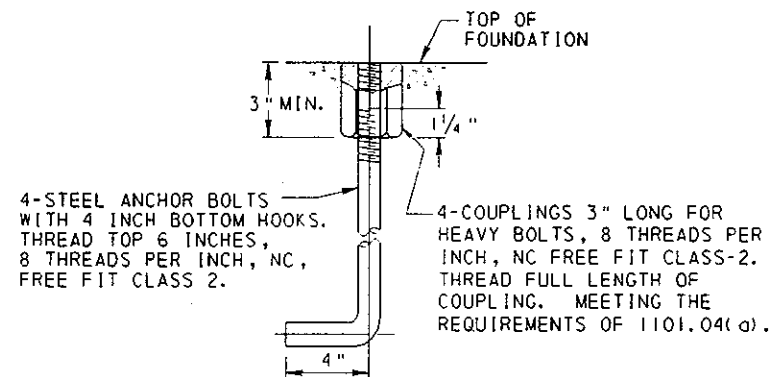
DETAIL FOR TYPE A POLE BASE FOR FILL SECTION
